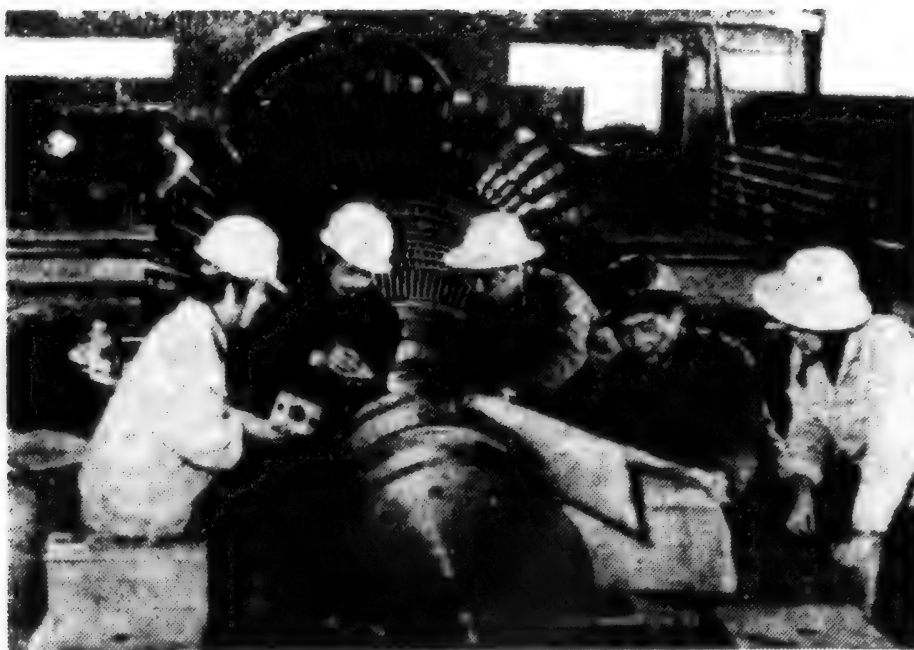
Photo shows workers of Datong Power Plant No 2, currently under construction in Shanxi, installing the No 1 generating unit. A large pit-mouth power station, Datong Power Plant No 2 has an installed total capacity of 1.2 million kilowatts and will be equipped with six domestically manufactured 200,000-kW steam-turbo generating units. The first three generating units are scheduled to go into operation by 1985. When completed, the power station will transmit electricity to Beijing via a 500,000 volts ultra high voltage transmission line.
